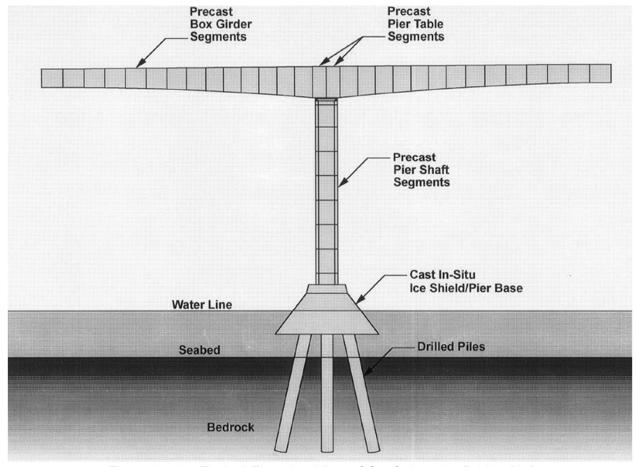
Typical Elevation View of Confederation Bridge [19]
